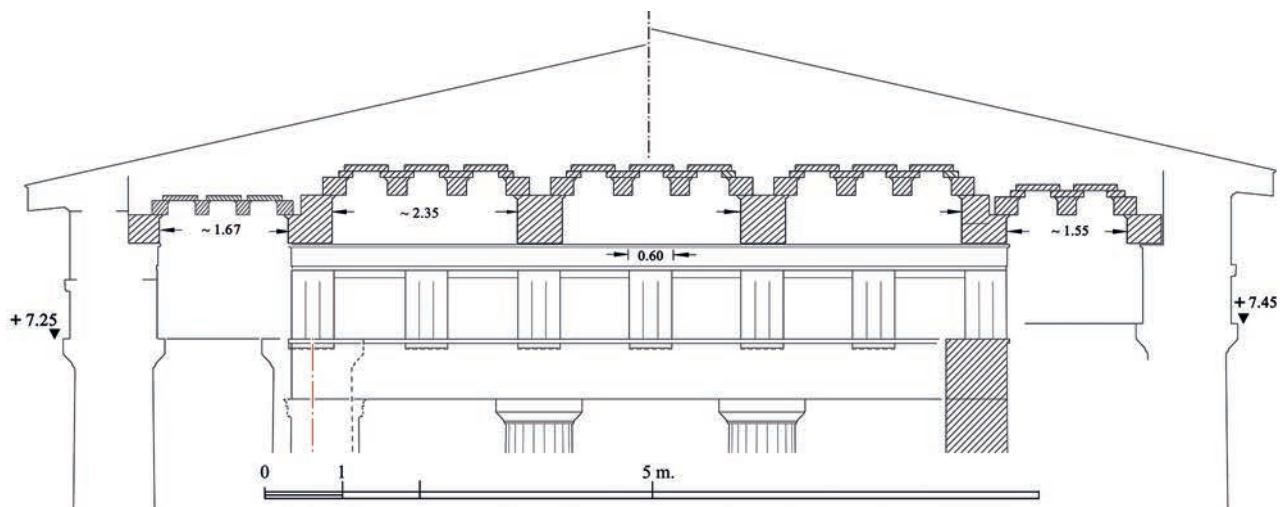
Reconstructed N-S section of the “Temple of Hippolytos” at Troizen with elevated ceiling beams in the east wing of the peristasis.
